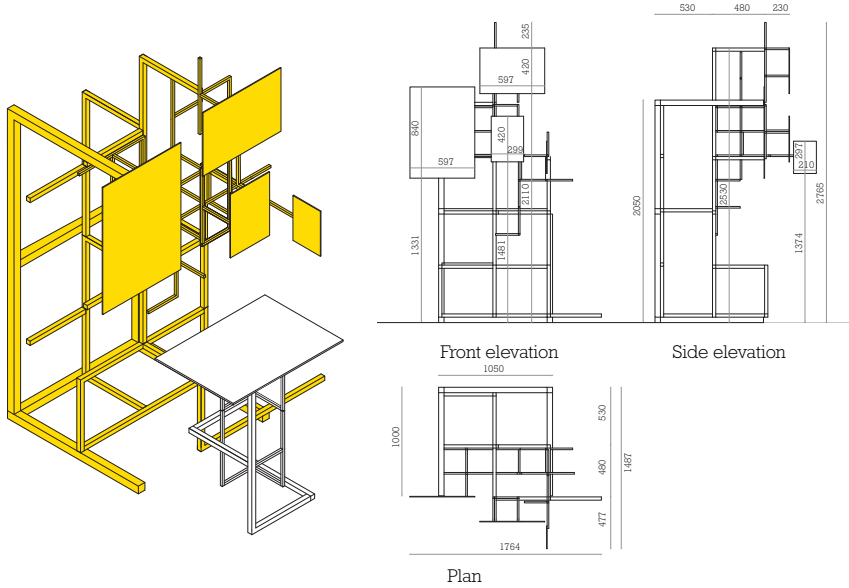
Construction detail - Main display elements | Axonometric view and dimensioned elevations.
